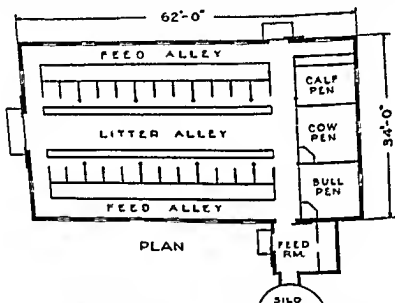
Floor plan of a typical stanchion type barn for dairy cattle. Note various features of interior arrangement. (Leaflet 232, U.S. Department of Agriculture.)
